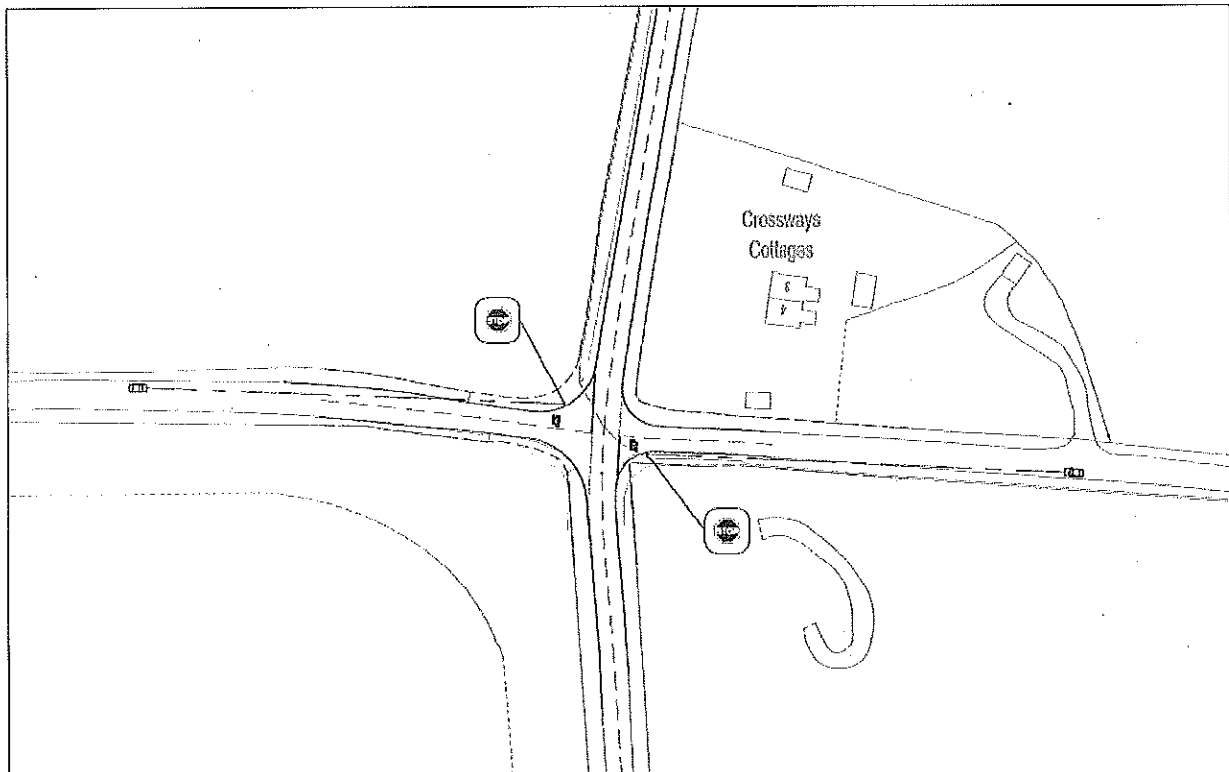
Proposed modified junction layout AECOM drawing 60445024-SKE-C-008-A
